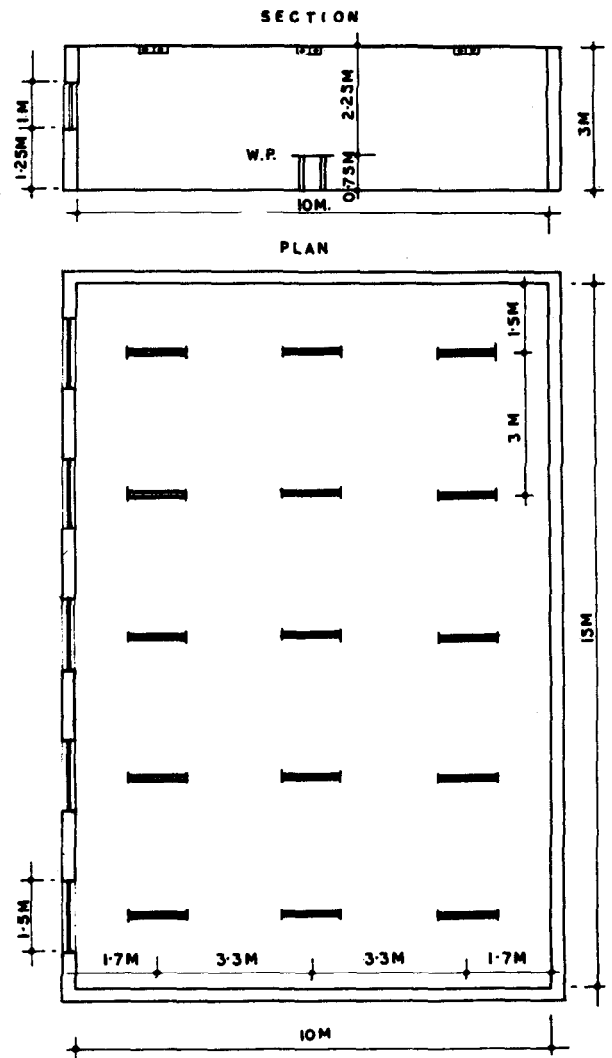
DISTRIBUTION OF TWIN LAMP LUMINAIRES ON SECTION AND PLAN (EXAMPLE 27)
